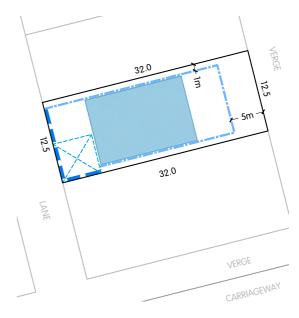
| Clarkefield Township Zone - Garden Character Area: Building Envelope 02 (Rear loaded, over 300m2)
